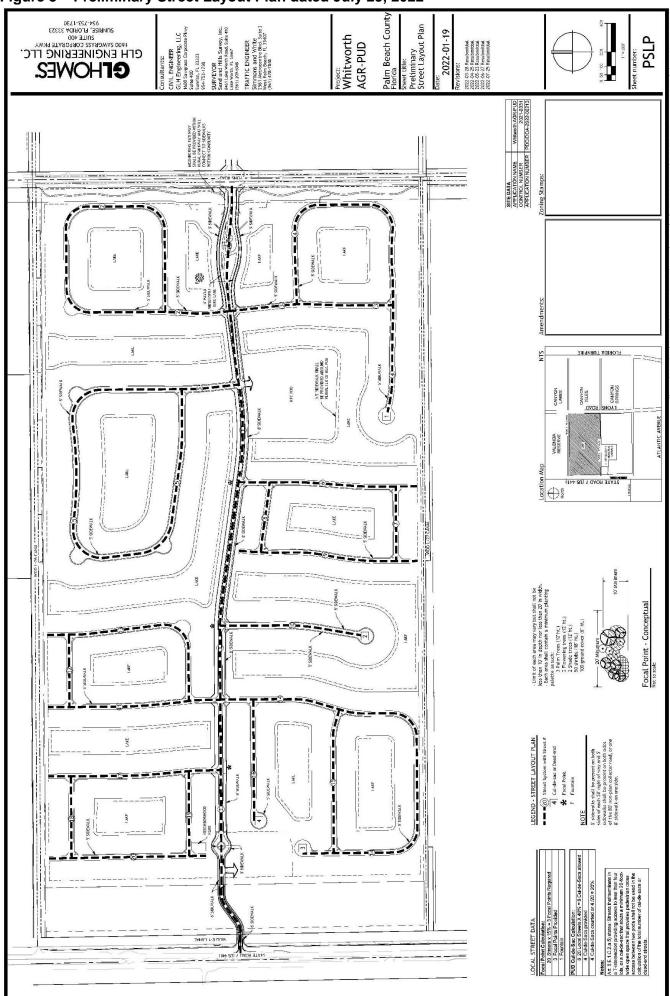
Preliminary Street Layout Plan dated July 25, 2022
